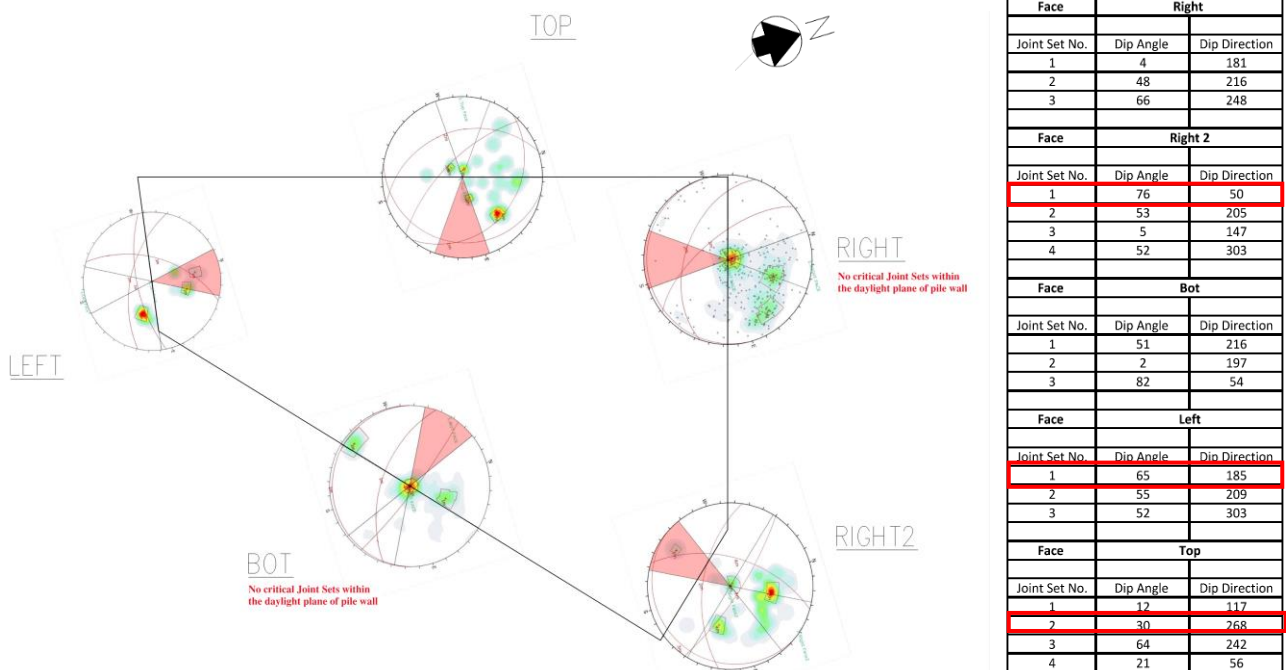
Plan showing rock joints at each excavated face of piled wall (Left) and summary table of joint sets (Right)
